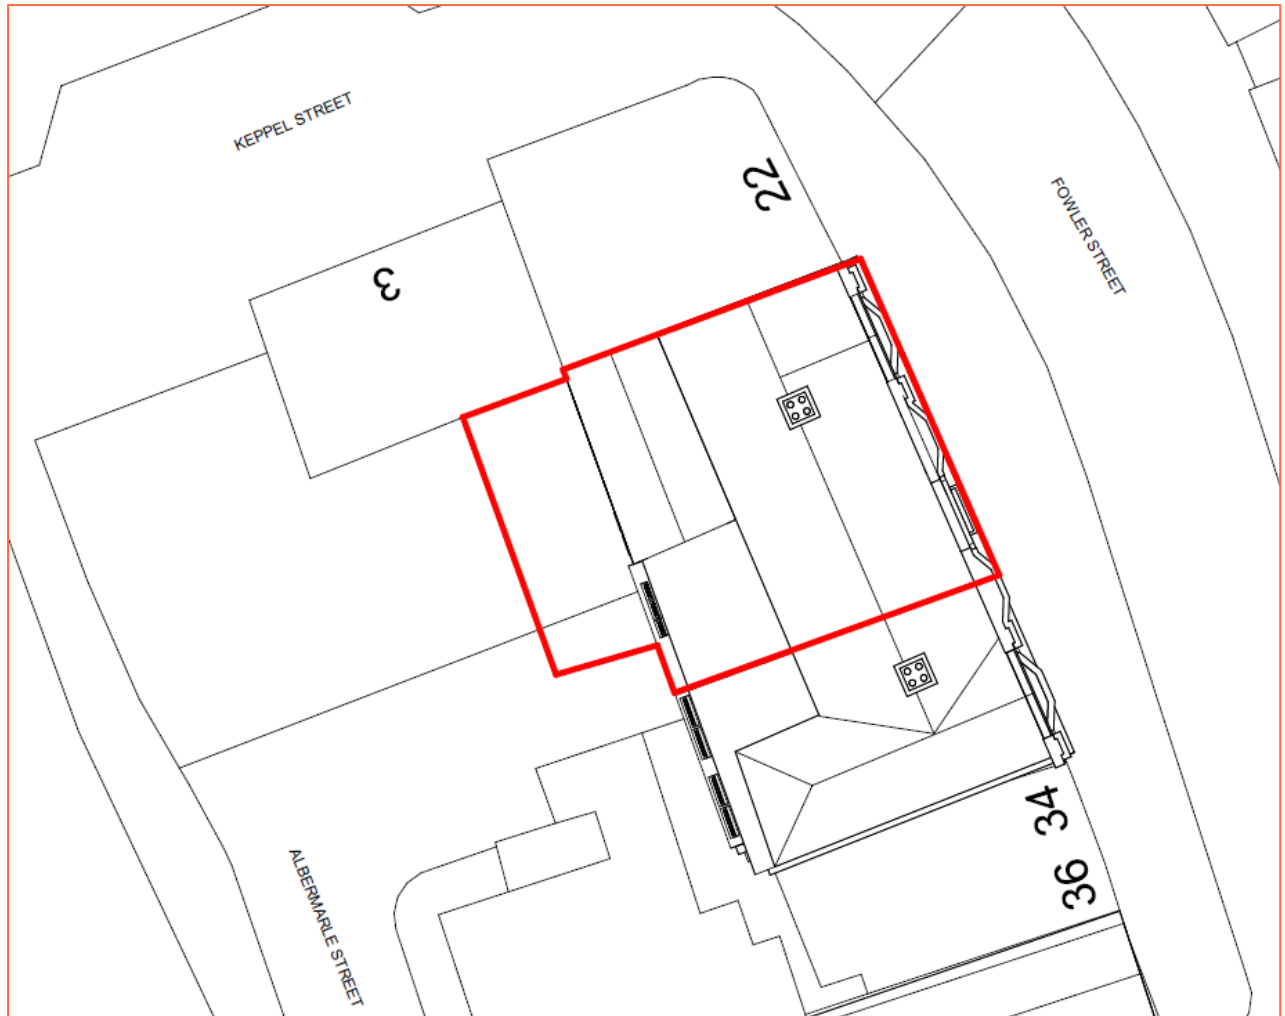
Site Location Plan – Fowler Street (Source: Create Architecture)
